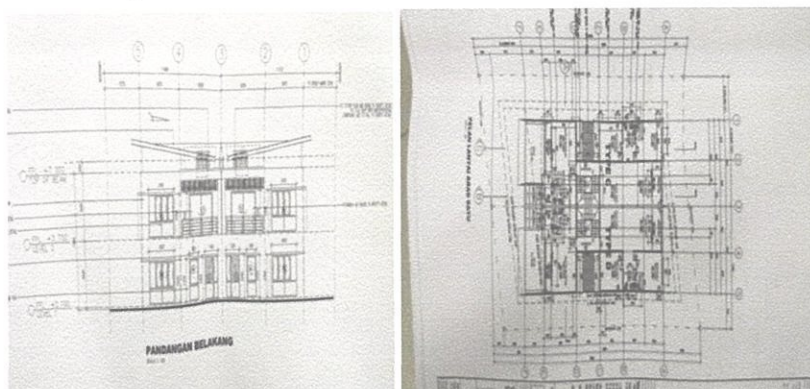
Plan and front elevation of project MESSRS Sime Darby Sungai Kantan Development SDN. BHD.
